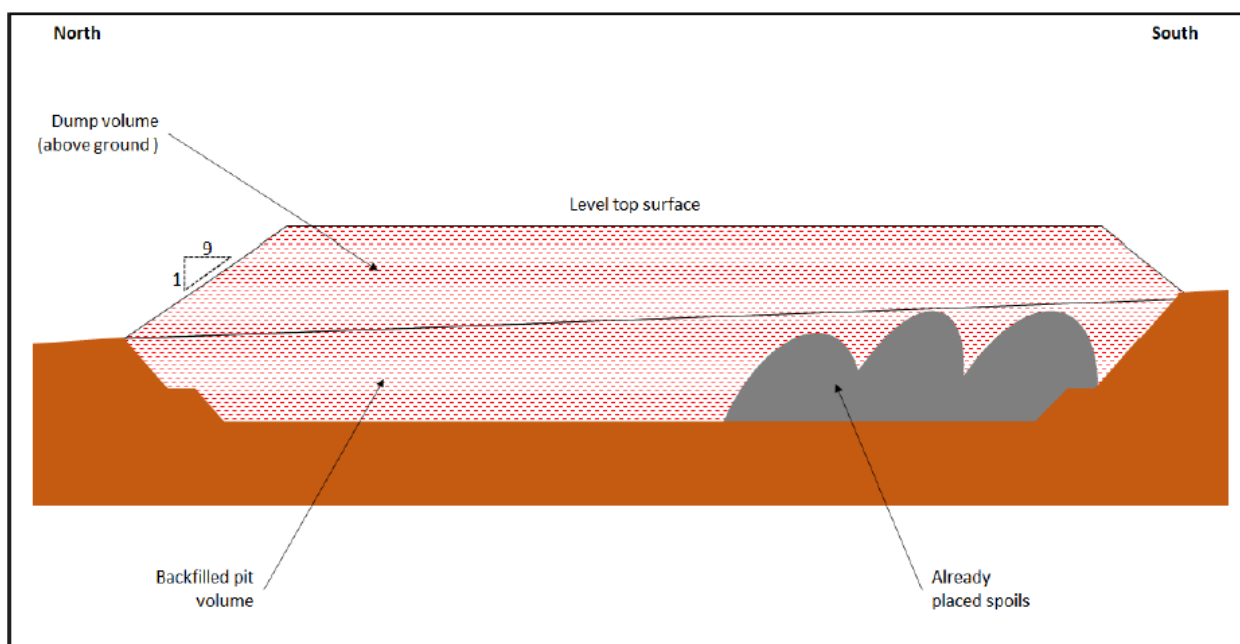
Option 2b schematic section showing discard placement as pit backfill and aboveground
